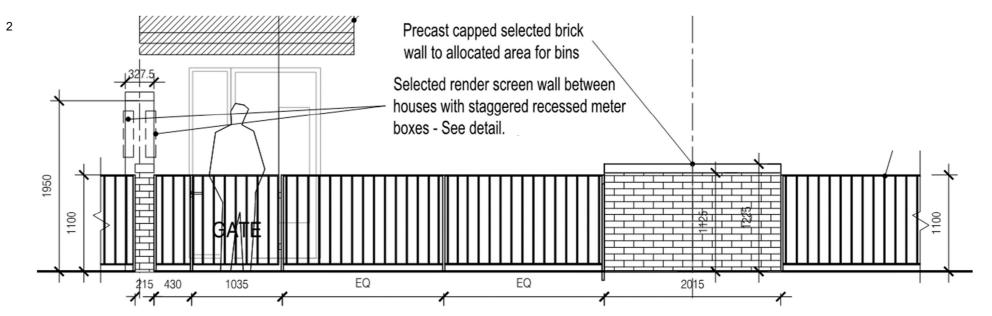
1.1m low painted metal railings and gates to front curtilages. 1.35m capped brick to bin enclosures.
